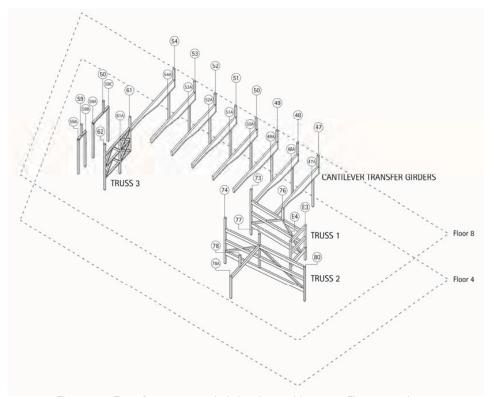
Transfer trusses and girders located between Floors 5 and 7
